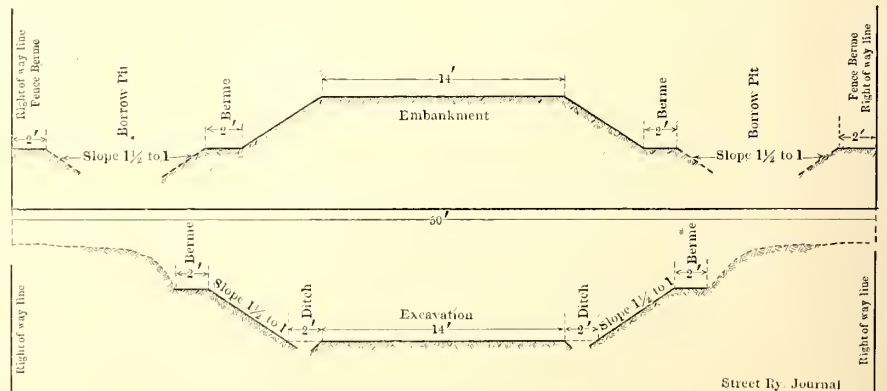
DETAIL CROSS-SECTION OF ROADBED
